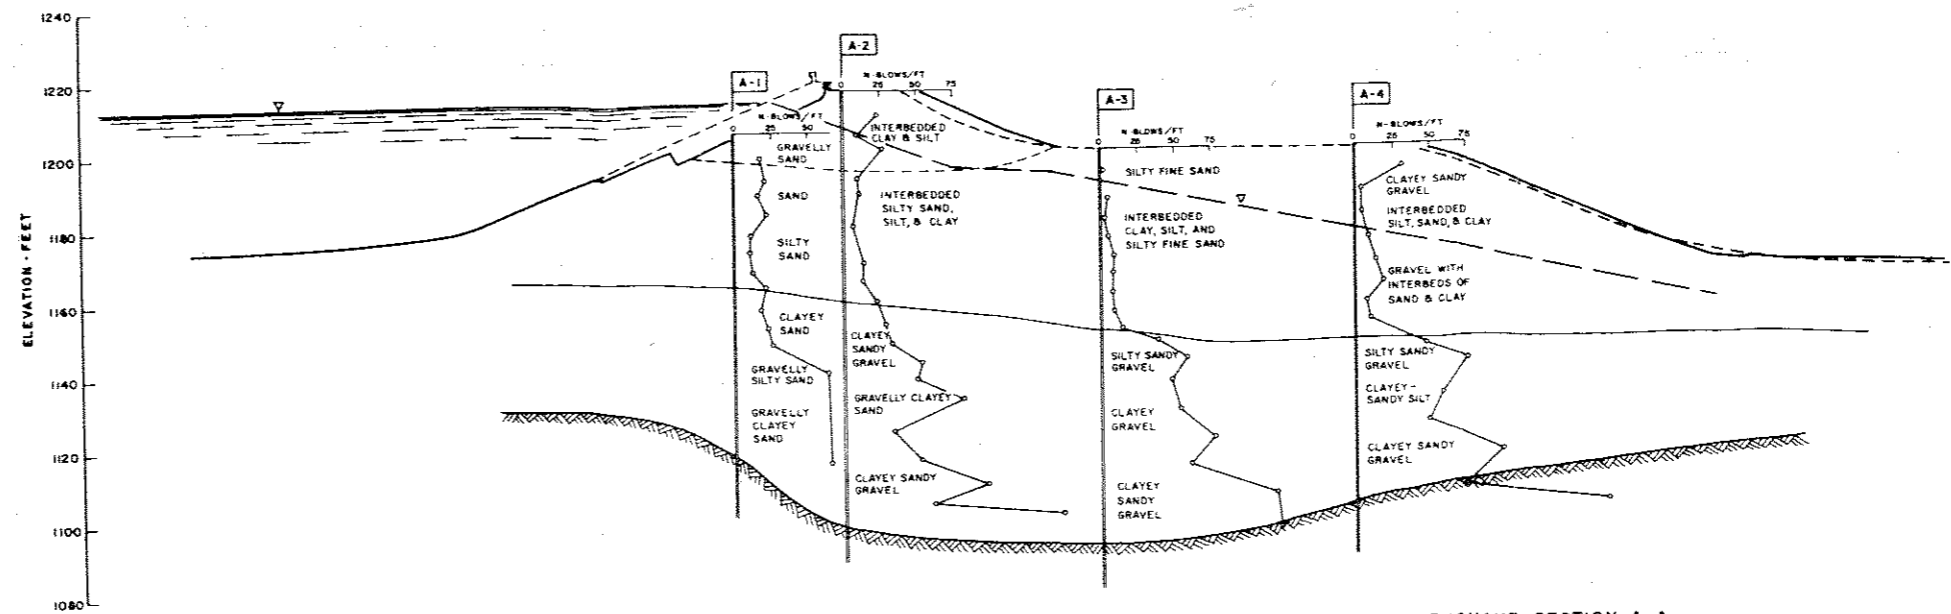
CROSS-SECTION THROUGH EMBANKMENT OF UPPER SAN FERNANDO DAM AFTER EARTHQUAKE, SECTION A-A
